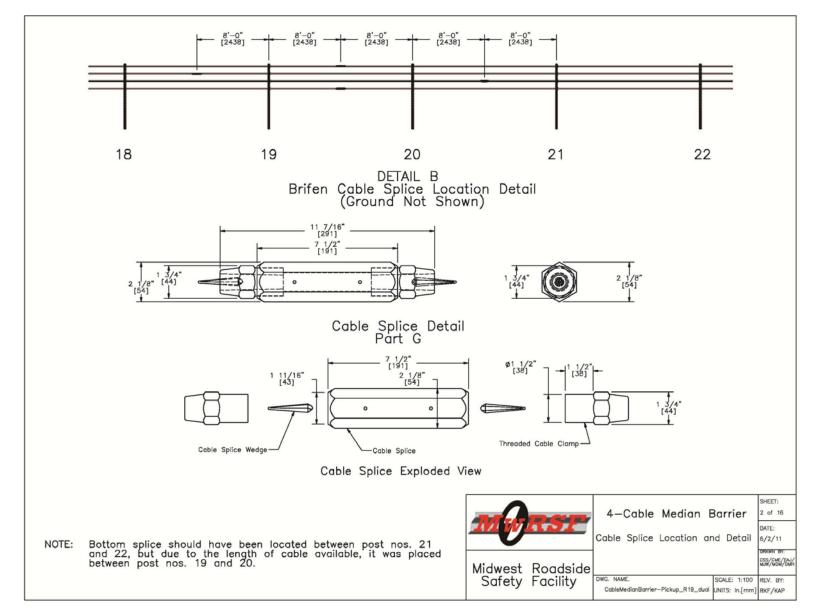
Cable Splice Location and Detail, Test No. 4CMB-1
